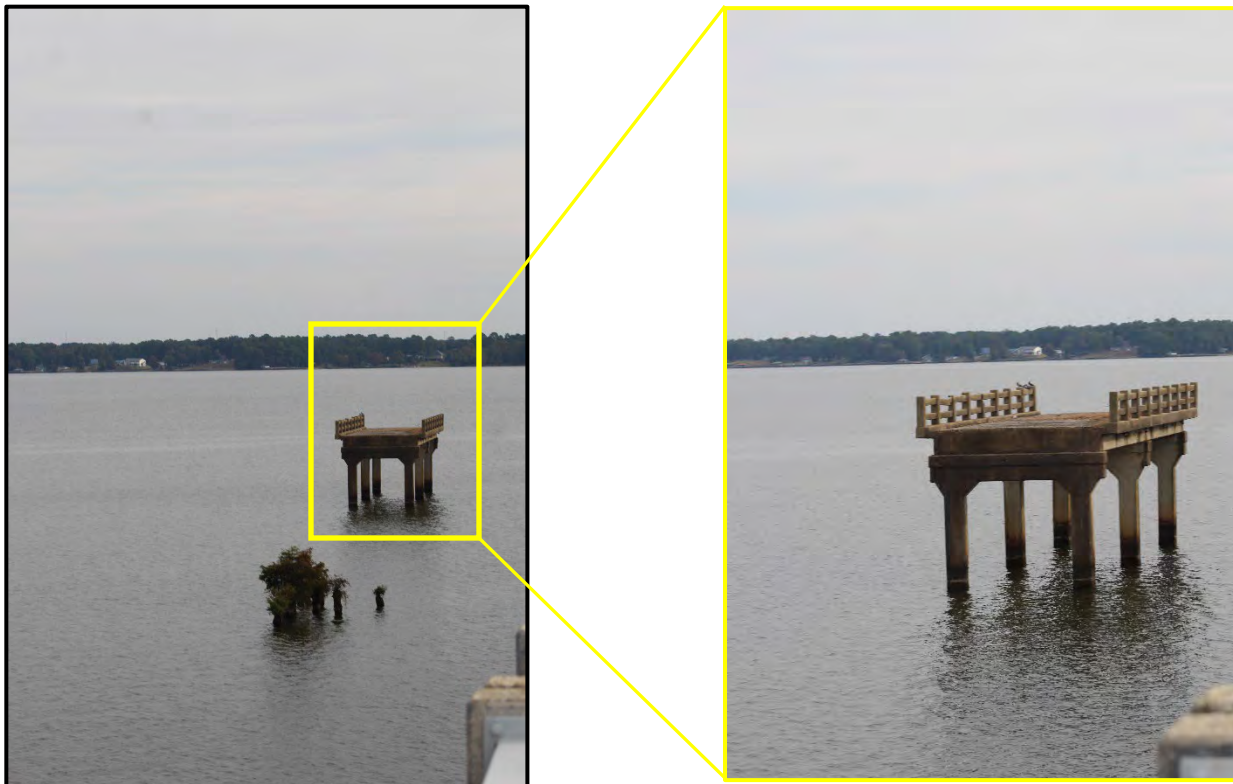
Cylindrical Concrete Piles. Four concrete piles per bent cap.
